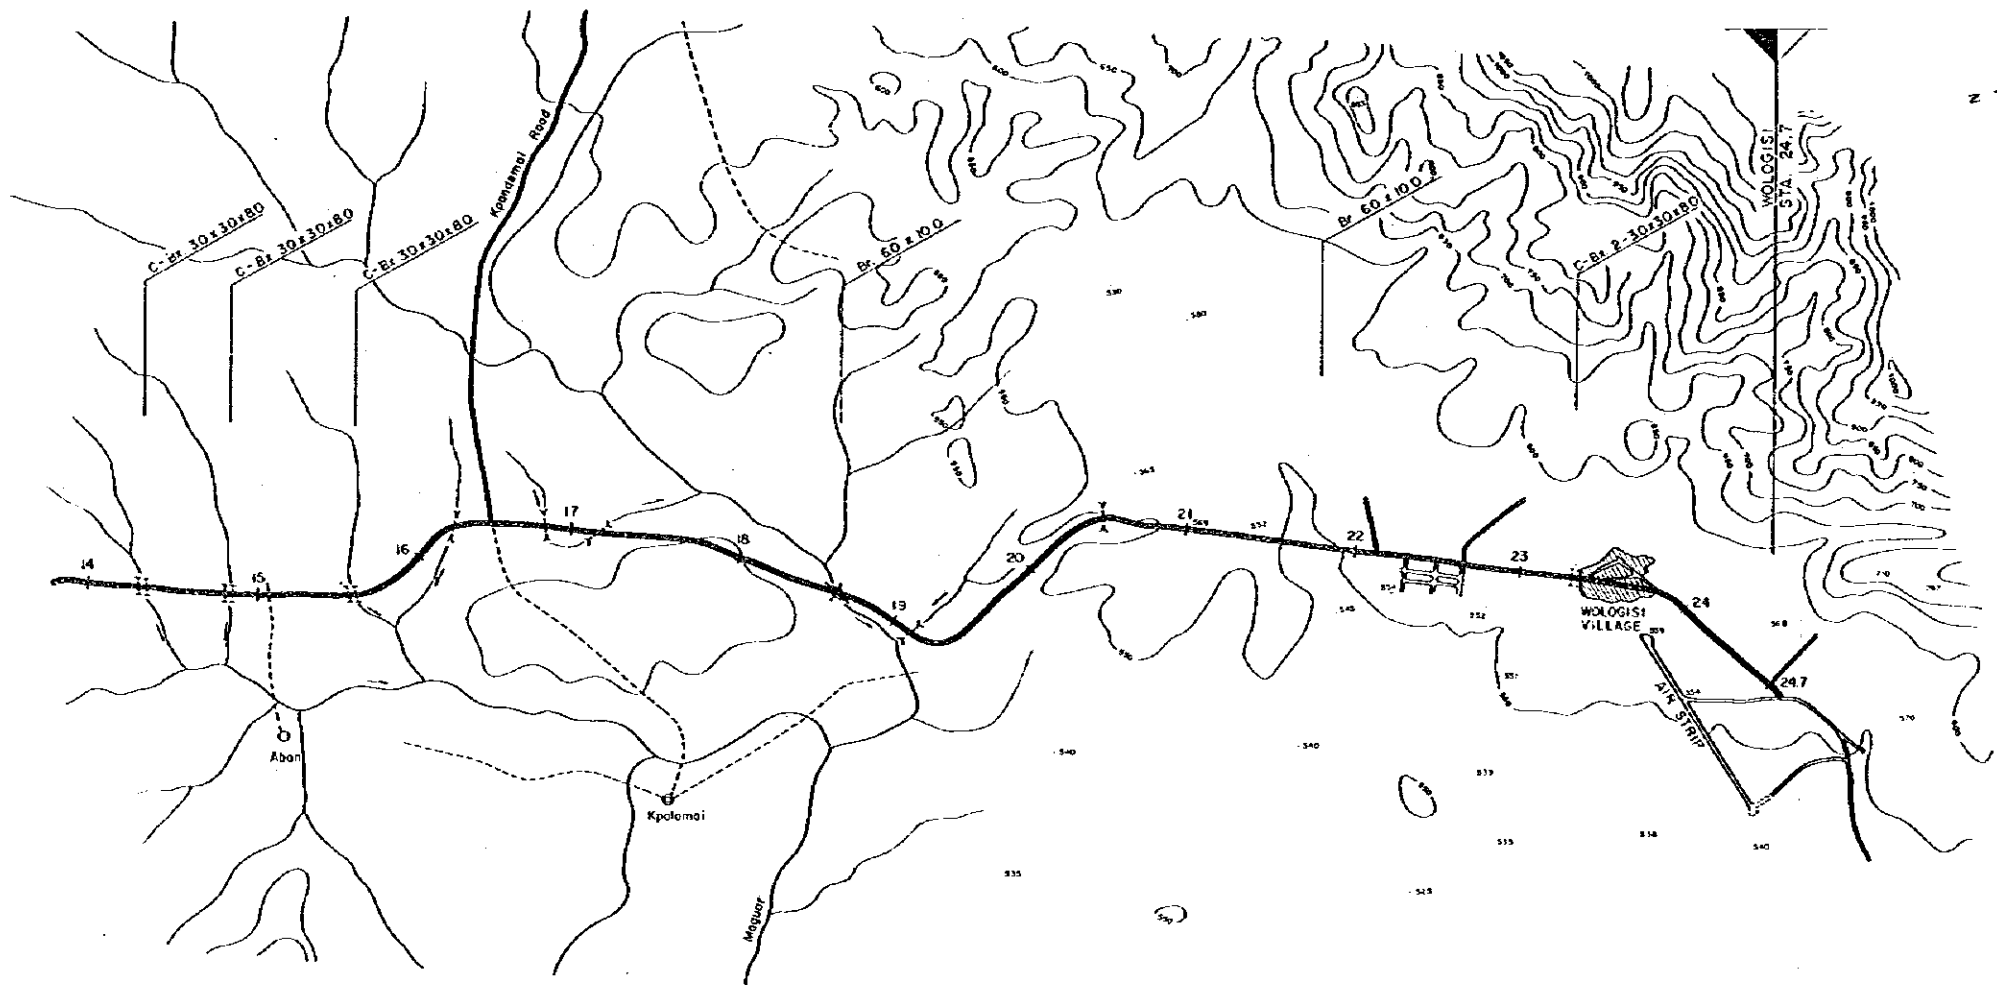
(2) ROAD PLAN AND PROFILE
